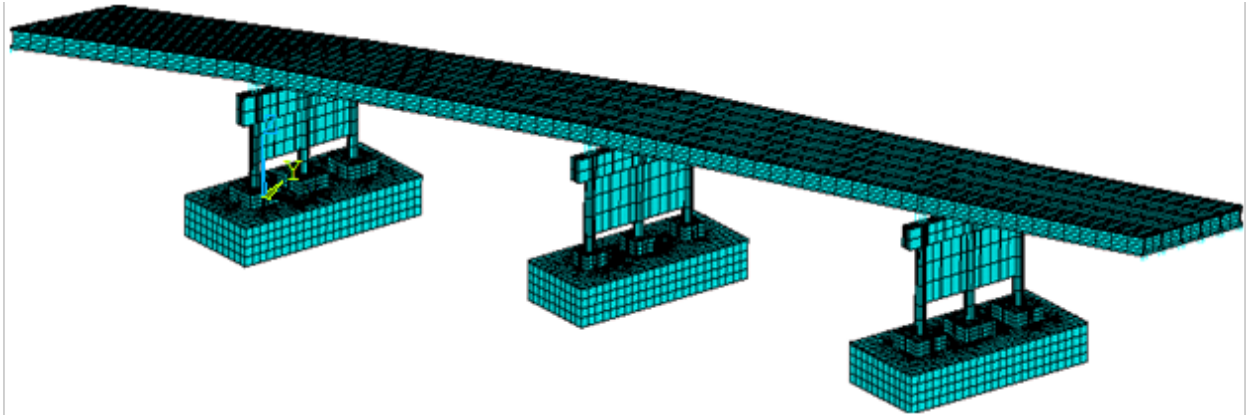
Finite element model of the New Trammel Creek Bridge.
